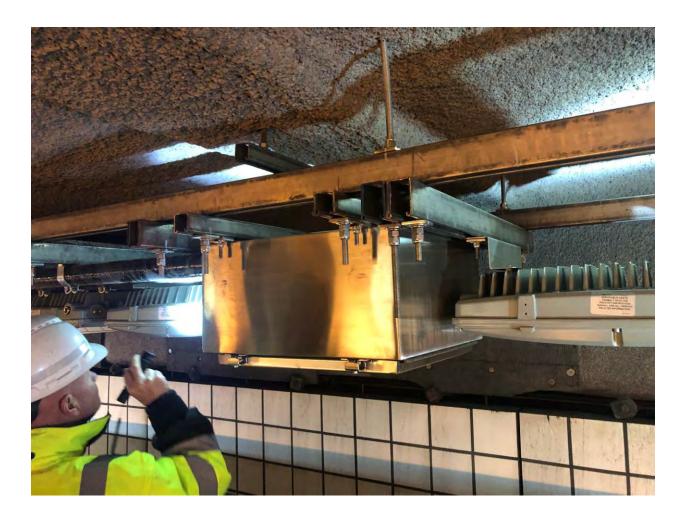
PHOTO TWO (below): Photo of installation of lighting in progress in Ramp L-CS tunnel.
